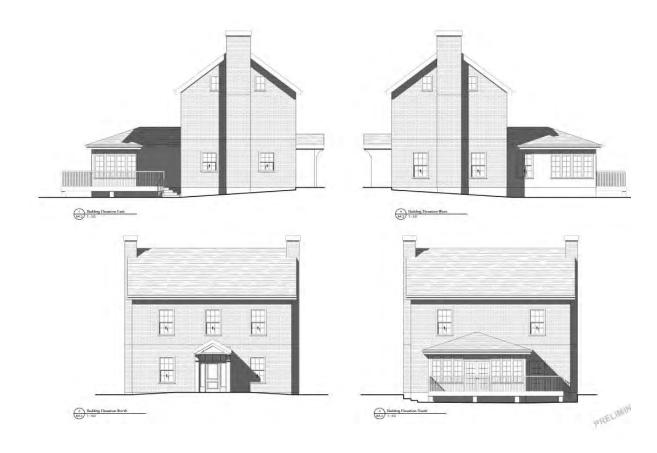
Architectural schematic of the proposed elevations of the new dwelling on-site (Source: Fryett Turner Architects Inc., 2023).
